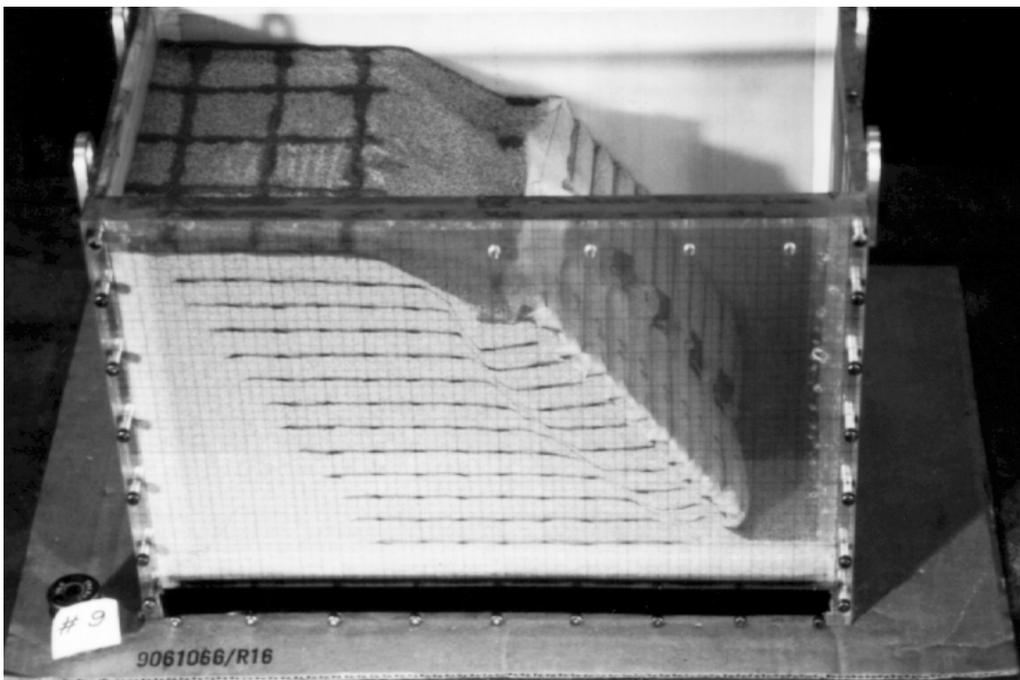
Reinforced slope model brought to failure by increasing the unit weight of the backfill.
